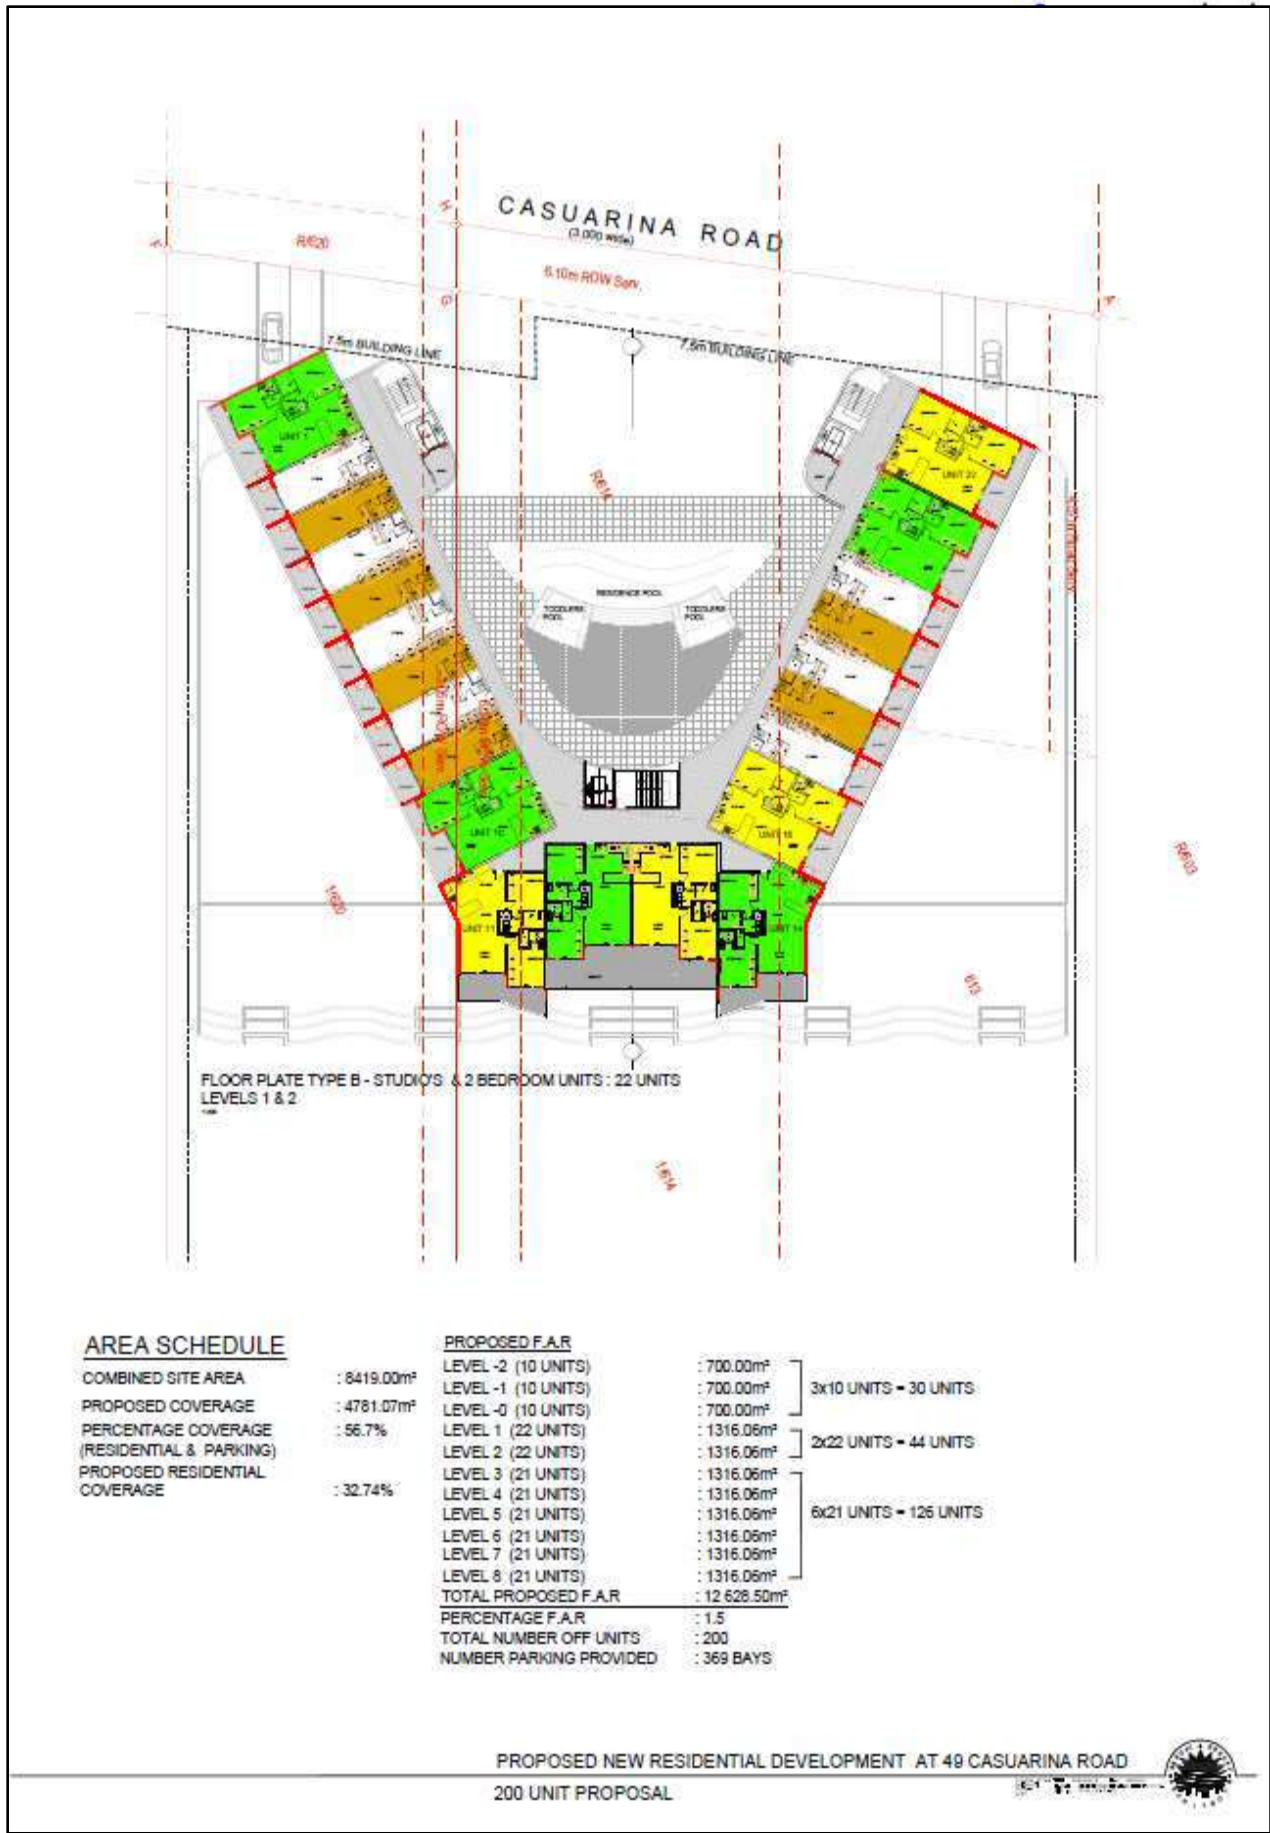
Preferred Layout Plan for Level 1 & 2 with Area Schedule
